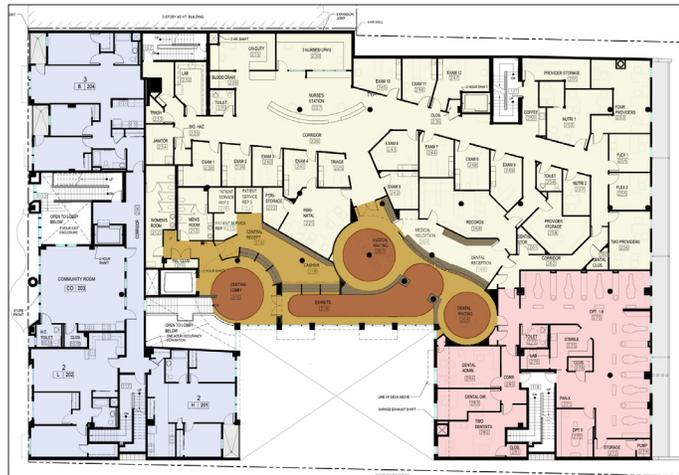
Second Floor Plan. Image courtesy of Pyatok Architects.
